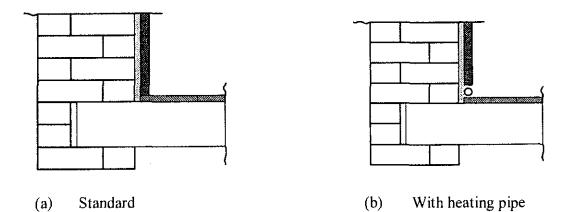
Junction between masonry wall with internal insulation and timber floor
